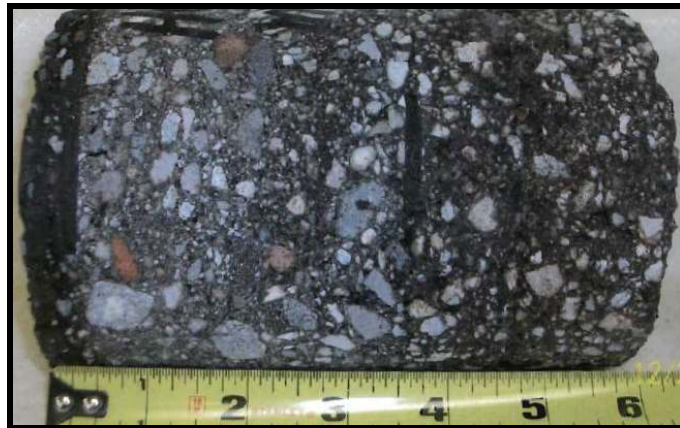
Sample Core Showing Flexible Pavement Surface Layer
